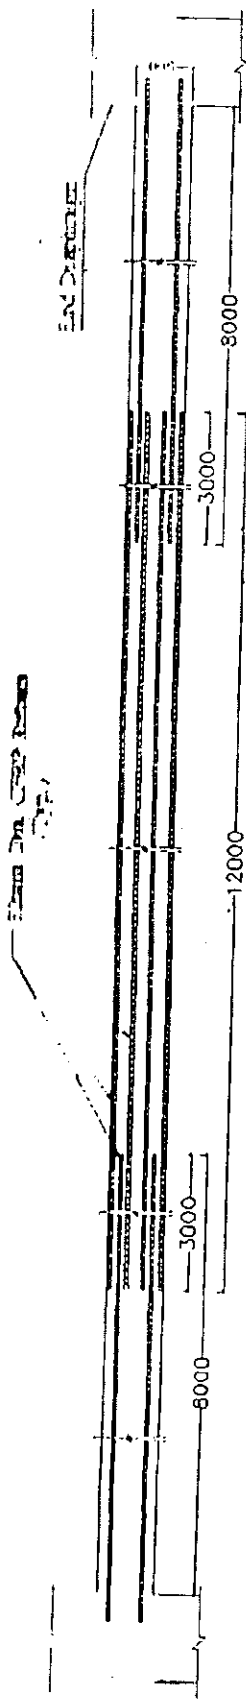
LAYOUT OF CFRP COMPOSITE REBARS FOR FLEXURAL STRENGTHENING OF GIRDERS USING NSM TECHNIQUE
